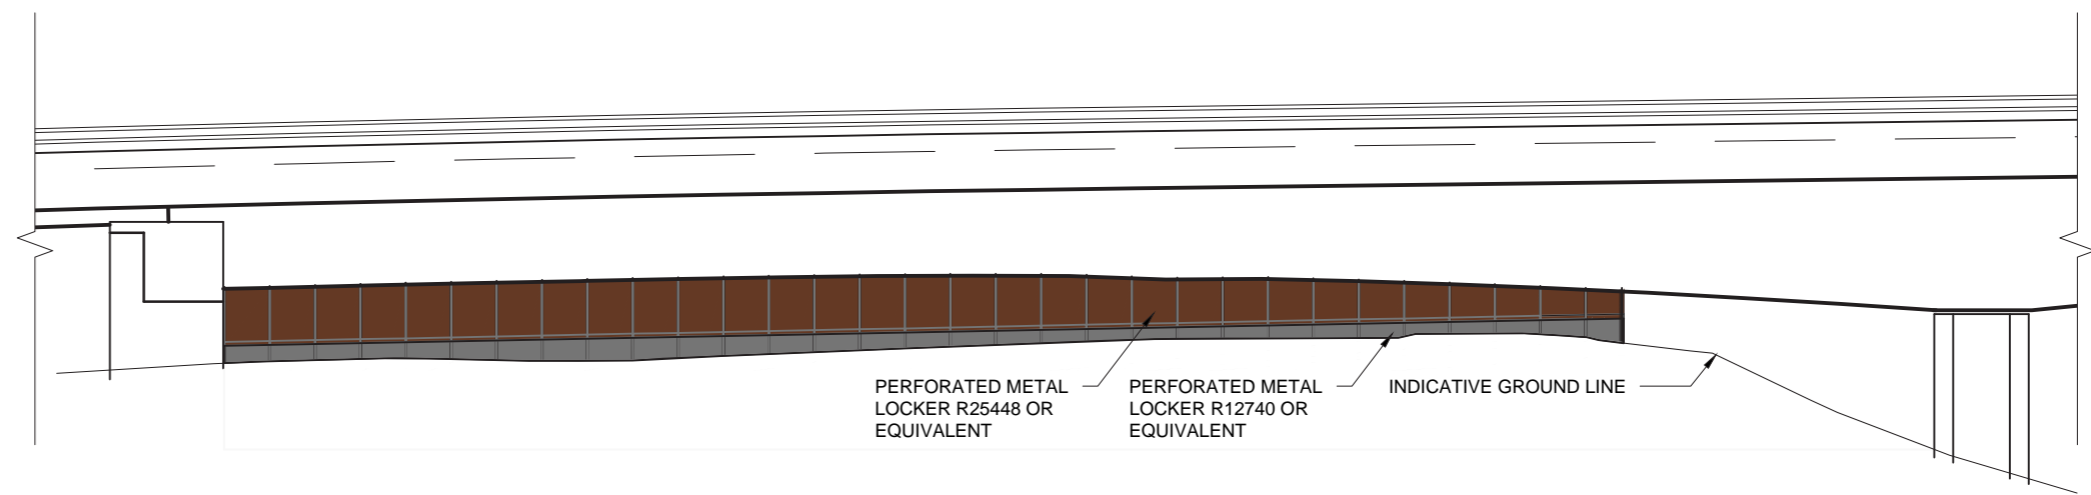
Western elevation of the northern abutment. Scale 1:200
